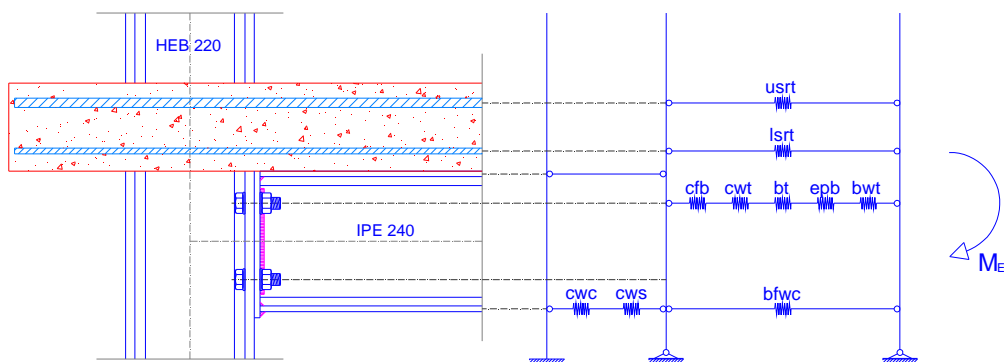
Single Side Beam-to-Column Joint connected on column flange (Type 1 and 2)
